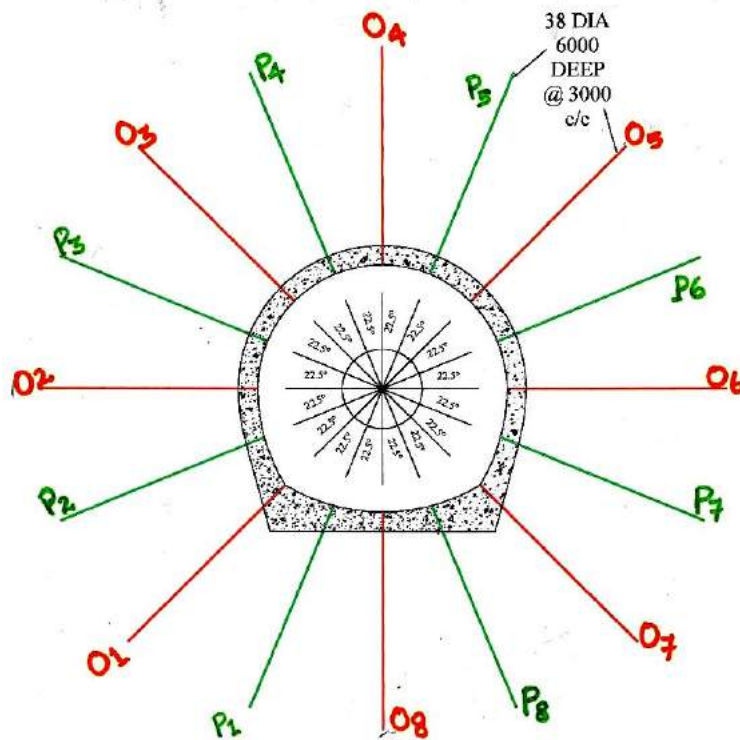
Design of drill holes in HRT for consolidation grouting (all classes of rock)
